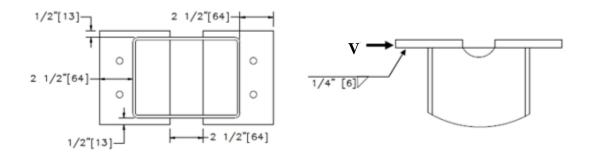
Weld Details and Force Acting on Bottom Base Plate
